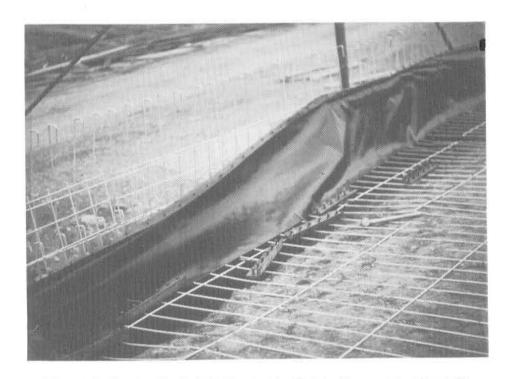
Geotextile Fabric Screen to Retain Compacted Backfill.
